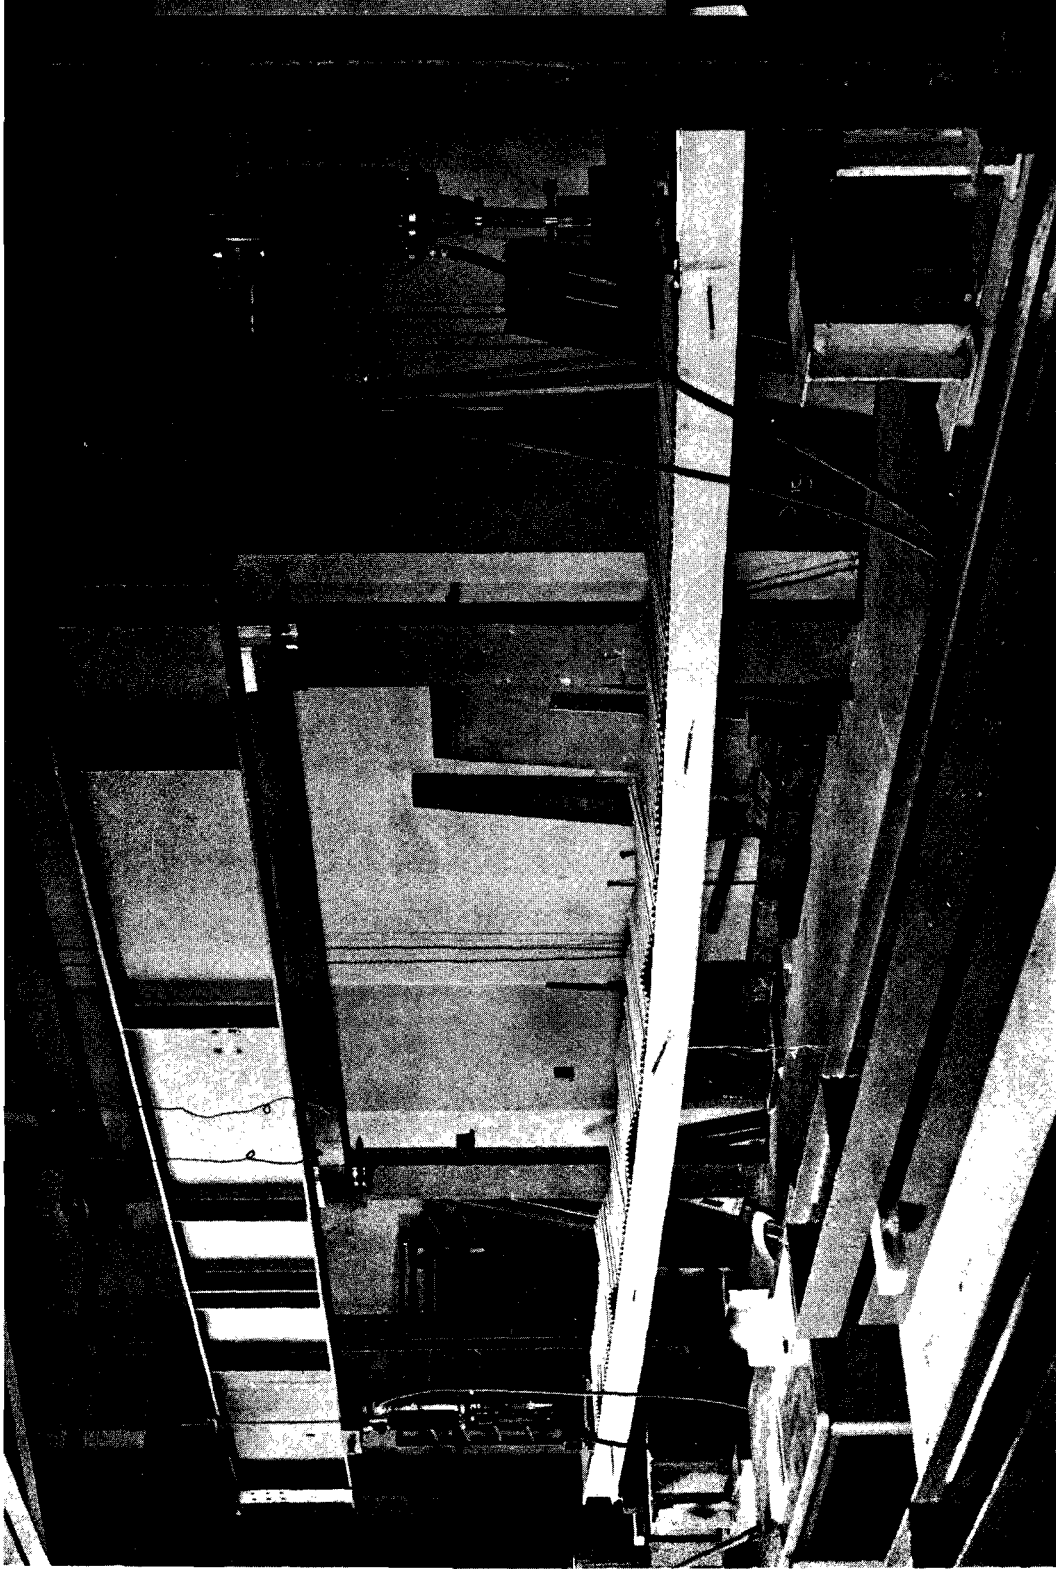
6[8.2 BEAM ASSEMBLY AFTER FAILURE
